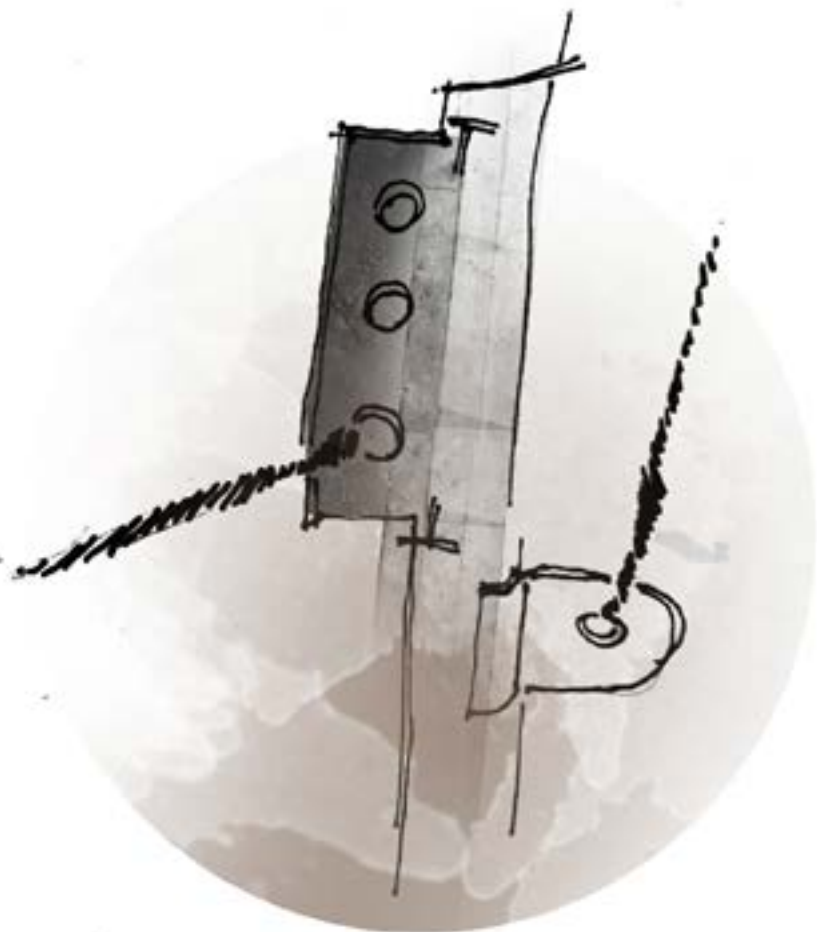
F: Architectural approach to joints (Author, 2021)
